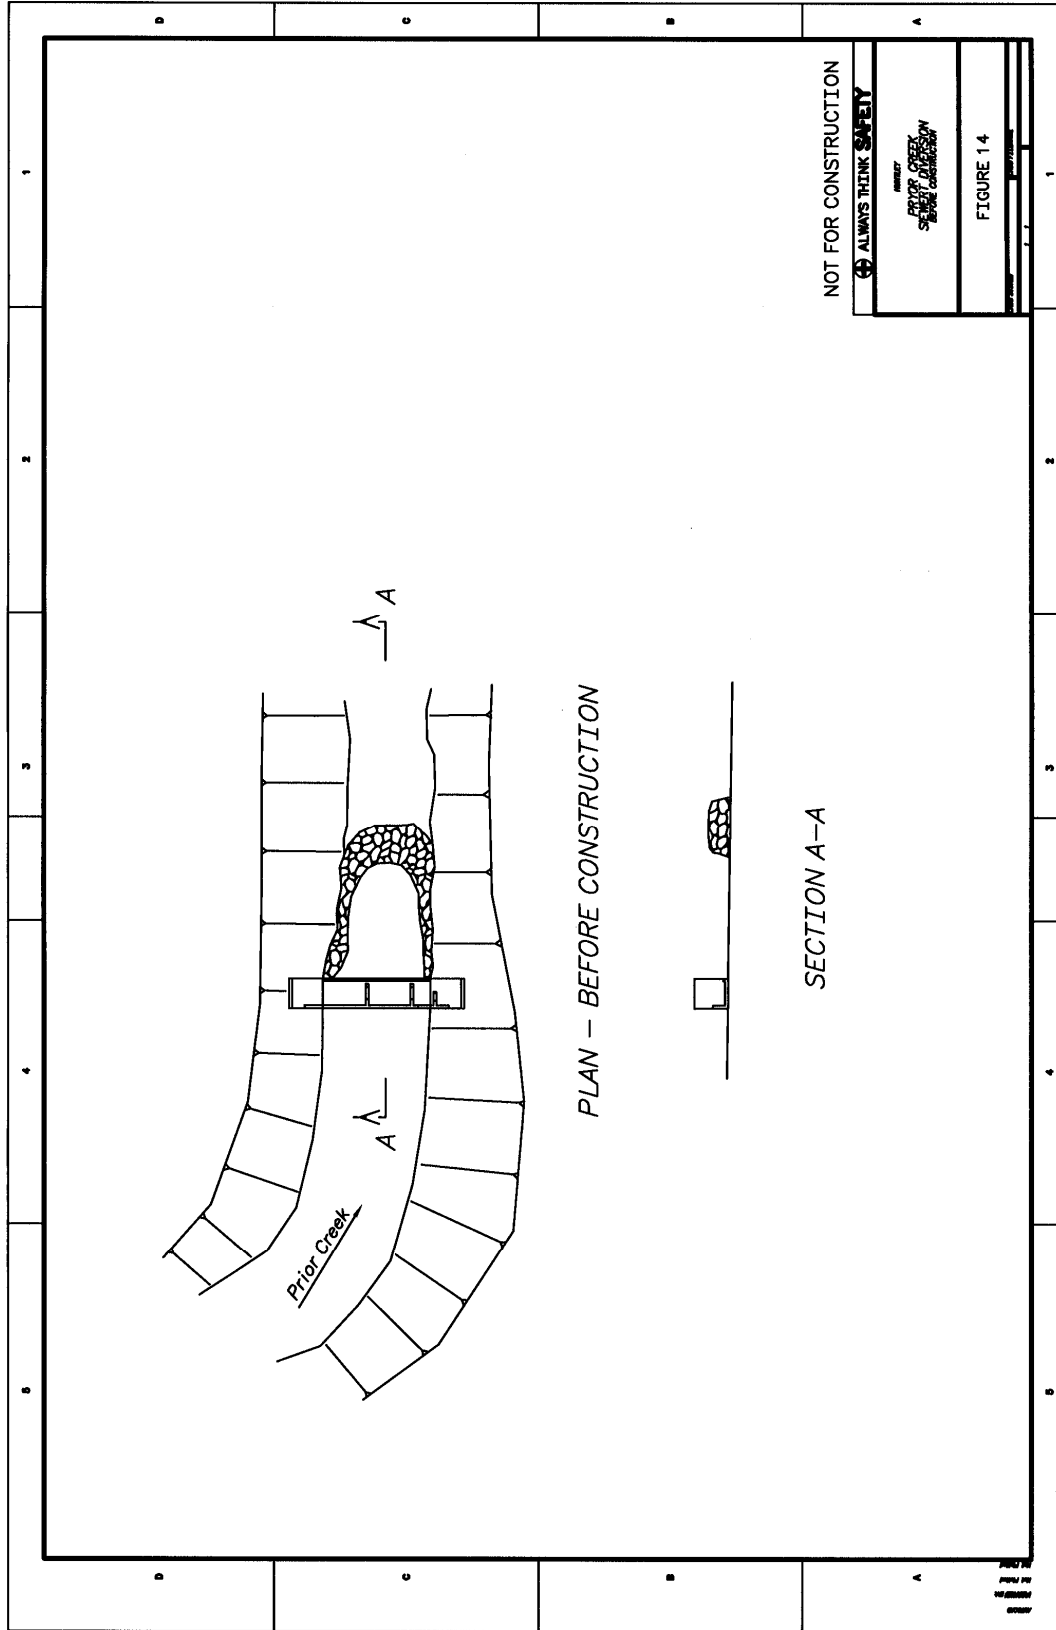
Plan and sections of Siewert Diversion Dam on Pryor Creek
